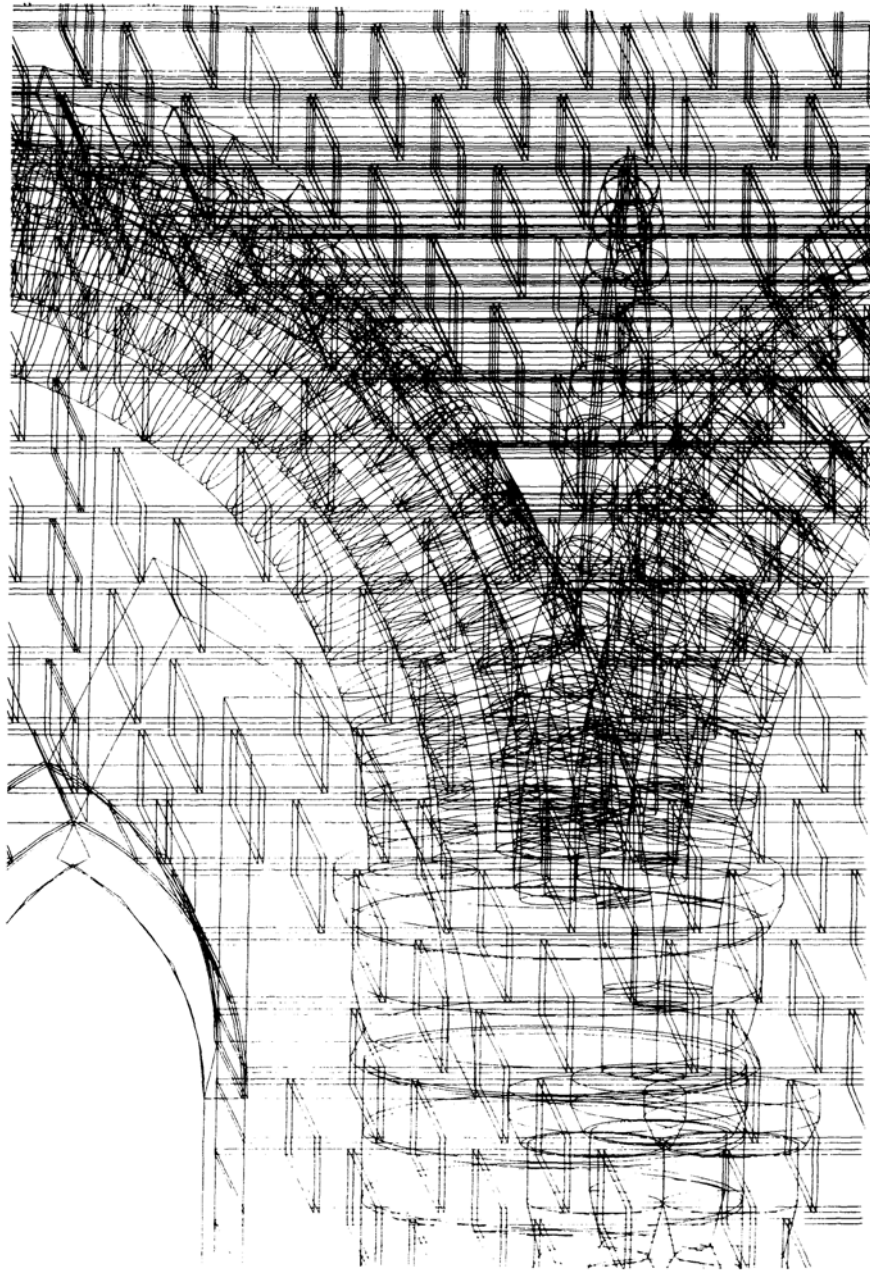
PDMS model—detail of GROUT plot of nave arcade with aisle walling and vaulting beyond, in wire-frame mode.
